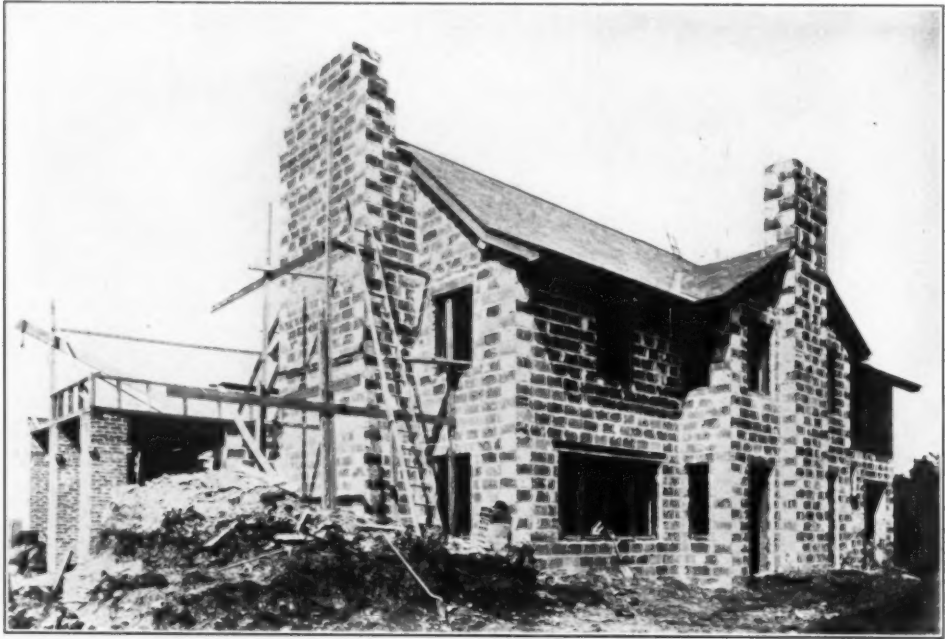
HOUSE OF MR. MATTHEW SULLIVAN DURING CONSTRUCTION.
